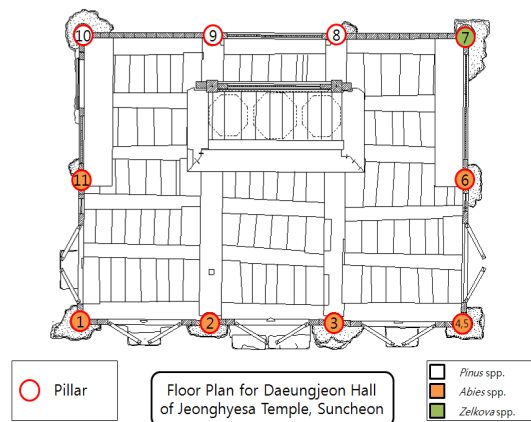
Floor plan documentation for Daeungjeon Hall of Jeonghyesa Temple, Suncheon.
